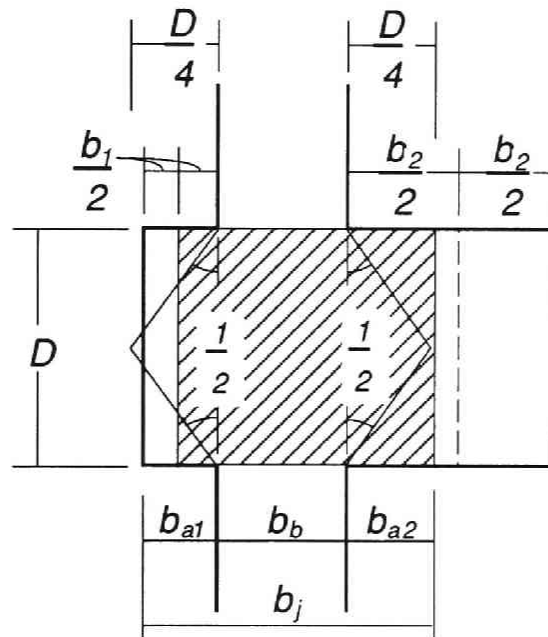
Design of beam - column joint according to AIJ Guidelines
